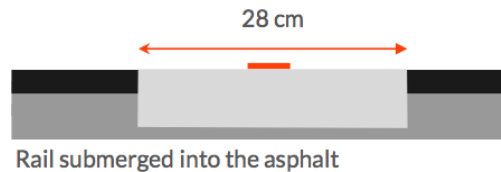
Cross section of road with rail submerged into the asphalt. Picture from Elonroad.
